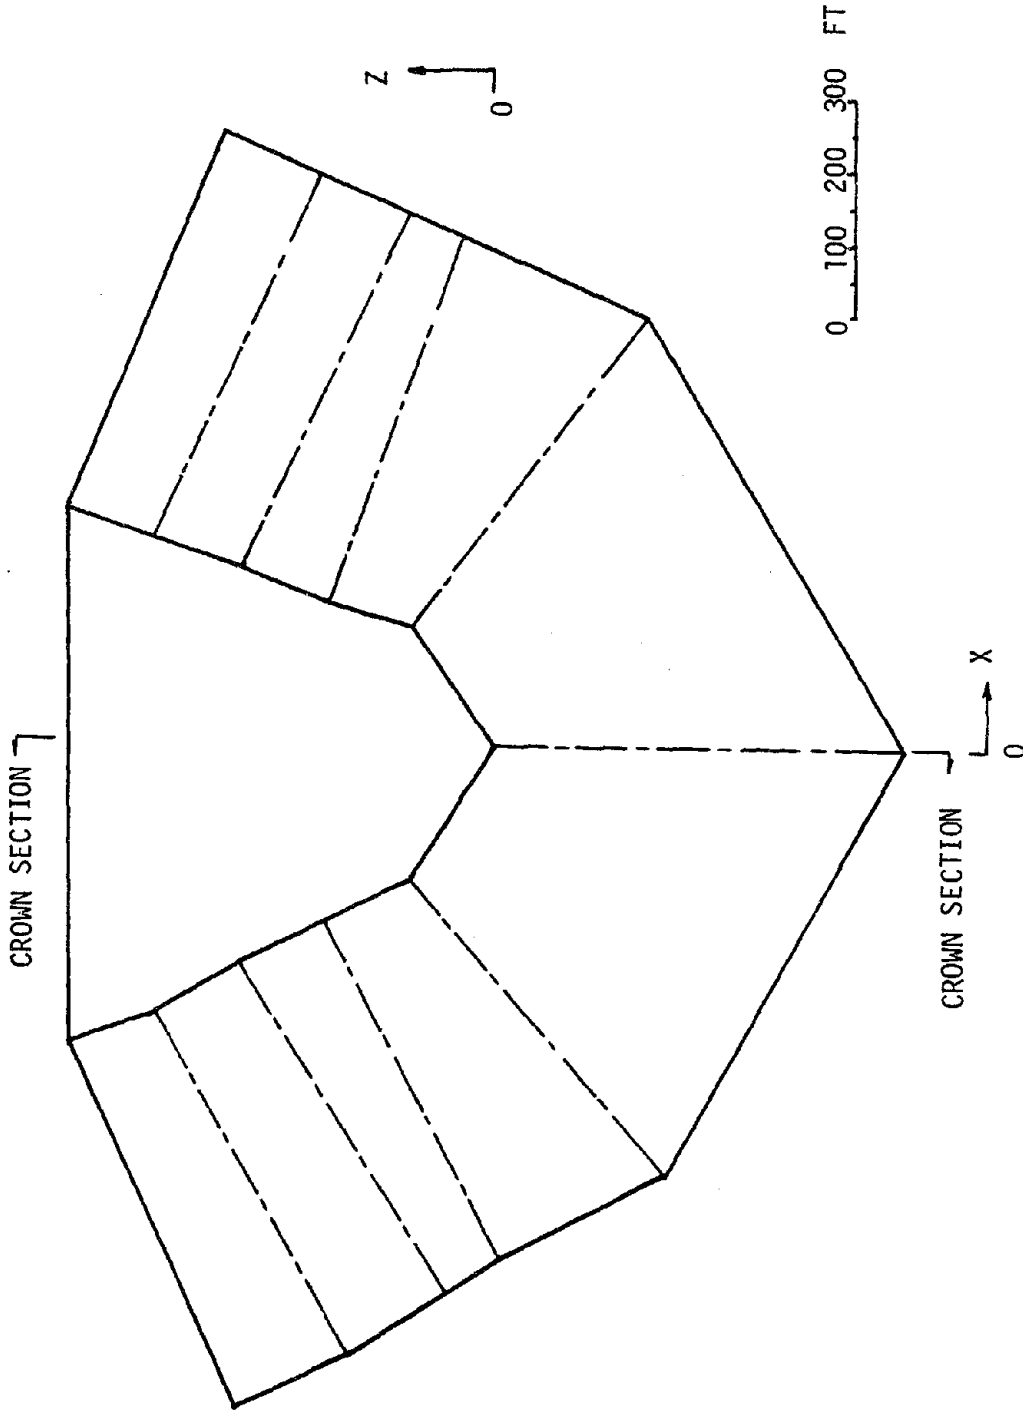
SECTION OF FOUNDATION BLOCK AT X-Z PLANE
